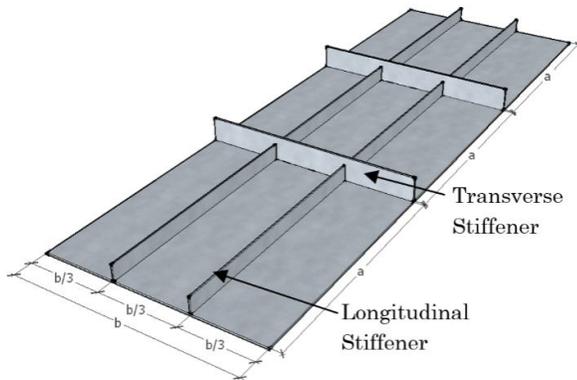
Stiffened steel plate used in the bottom flange of steel box girder      Figure 2. Plate-like buckling of a stiffened plate
